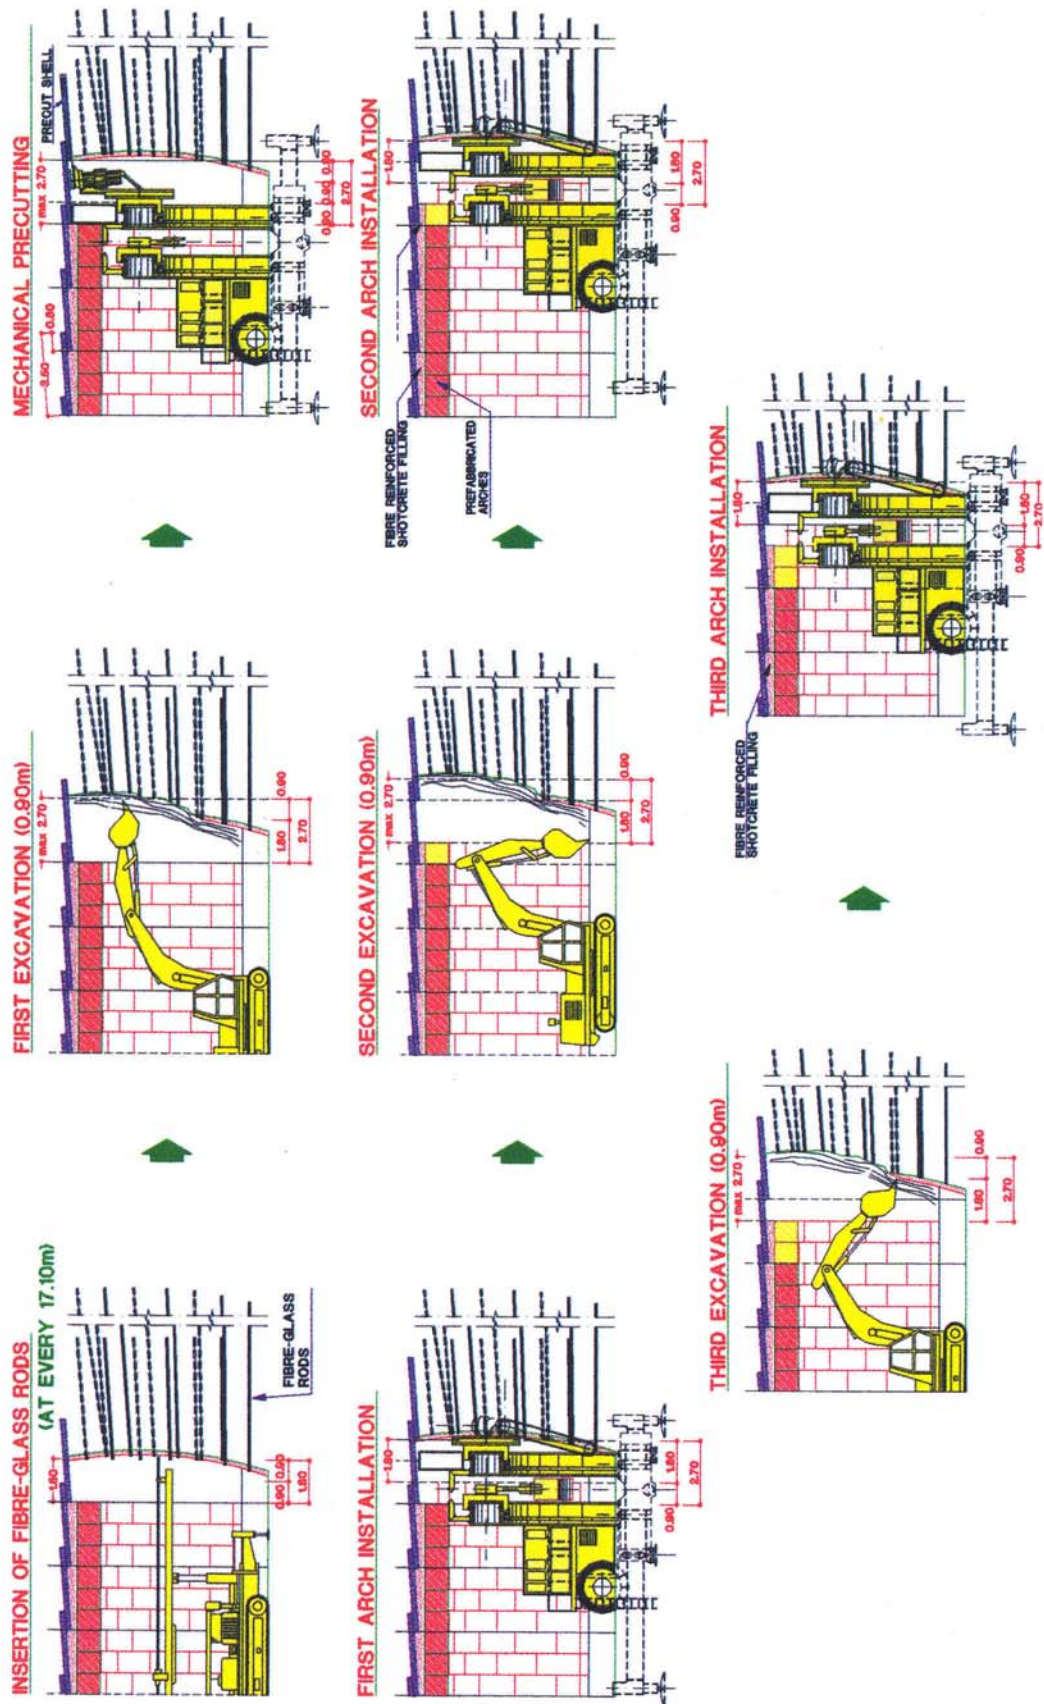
"Baldo degli Ubaldi" Station-Tunnel Crown Excavation Construction Phases
